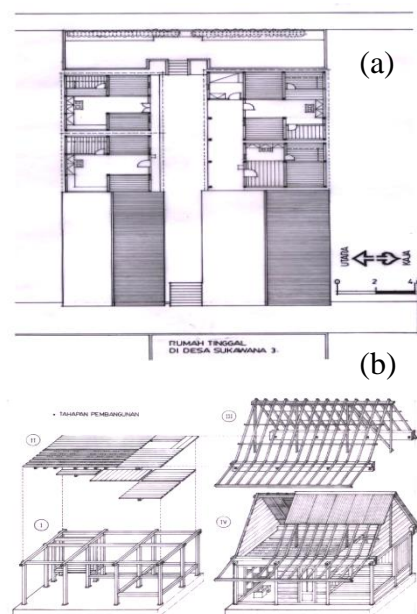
(a) Traditional house plan, (b) stages of building construction.
